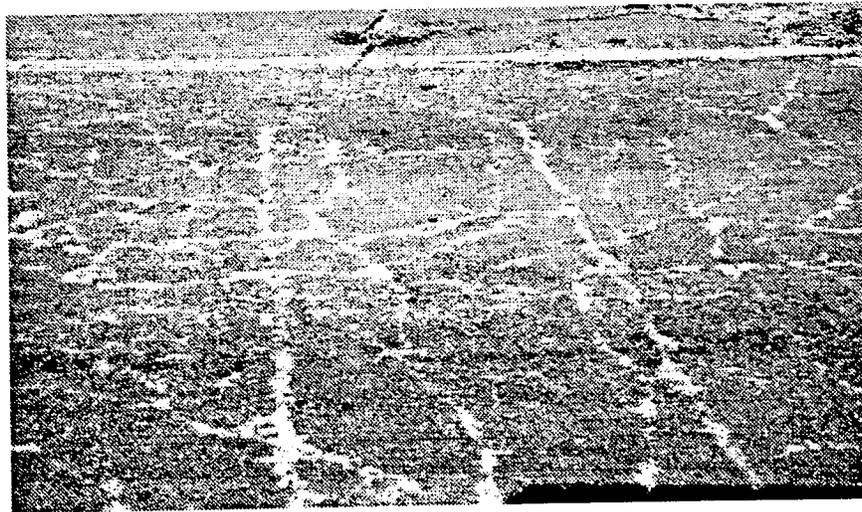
Crack Pattern for a Cracked and Seated Pavement.
